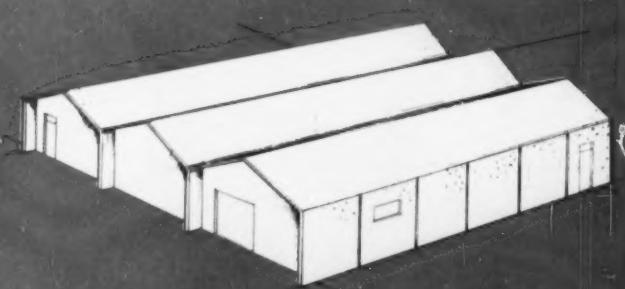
Building with tilt up walls made continuous by roof plate. The walls act as vertical beams.
